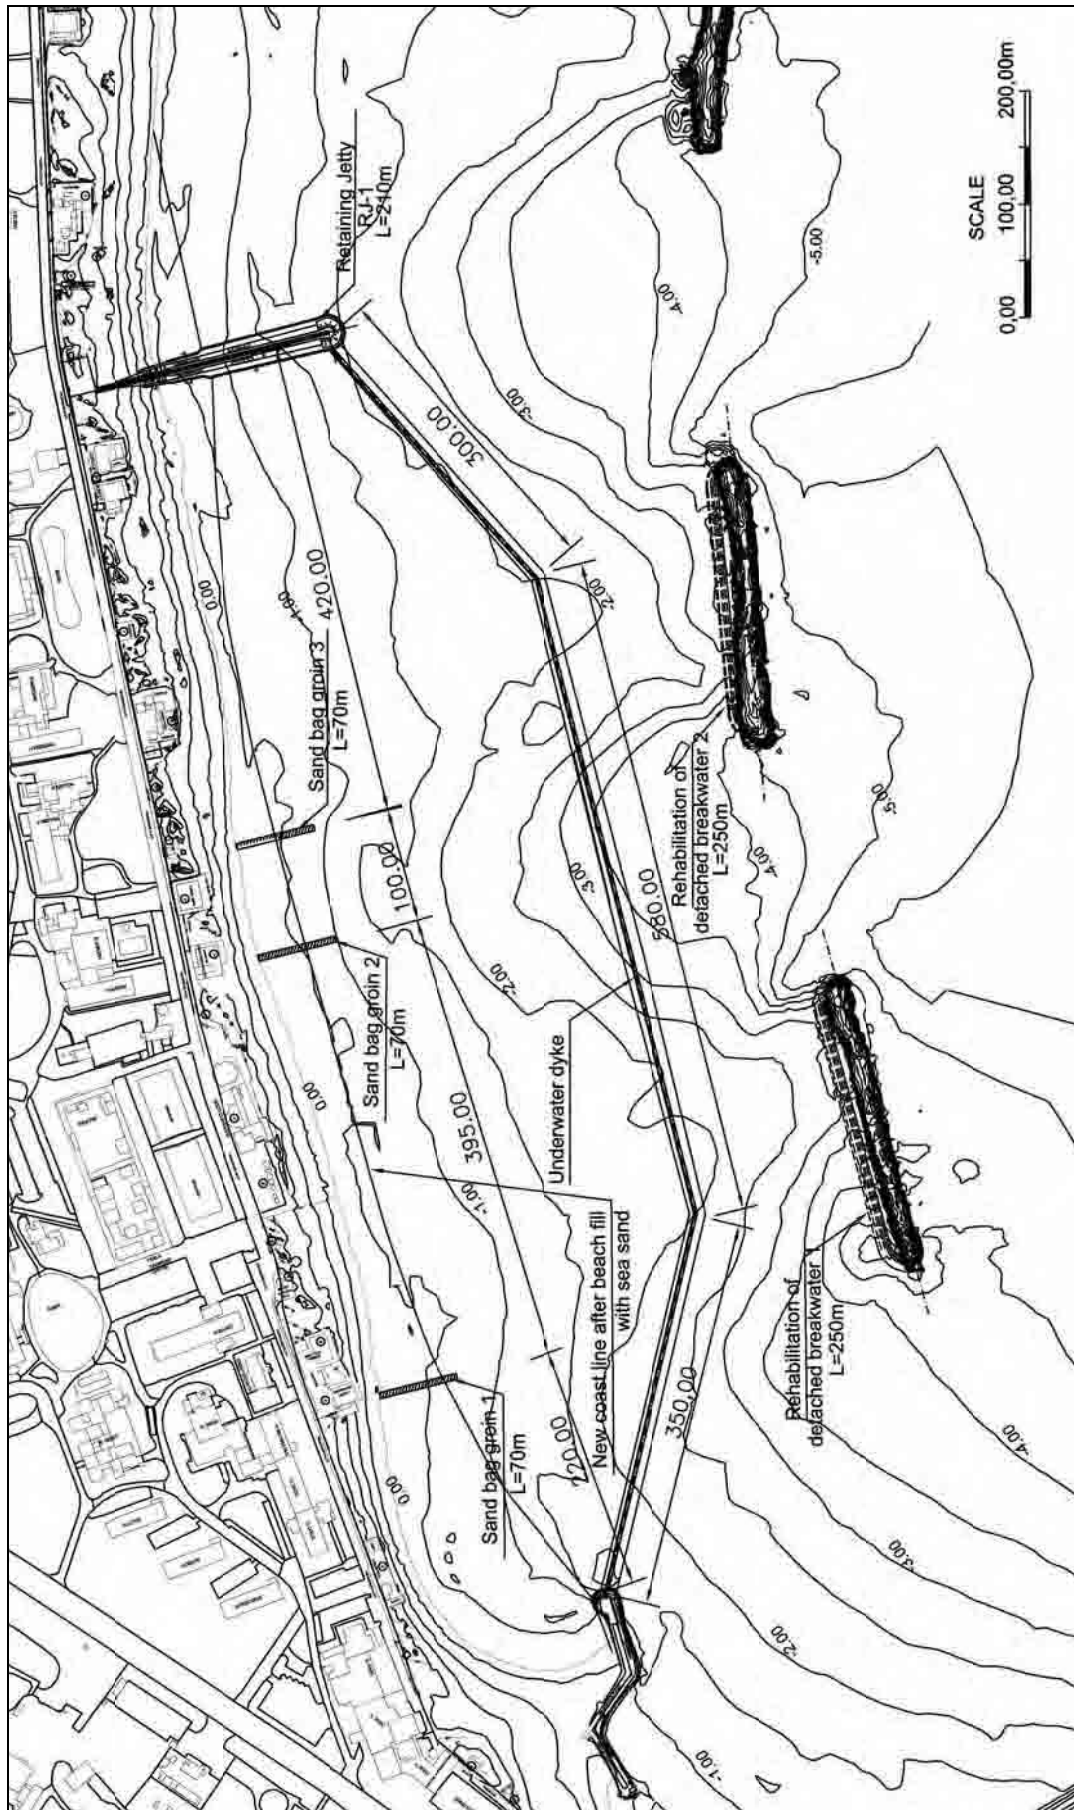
General layout of shore protection facilities at Mamaia Sud with sea sand (southern part)
